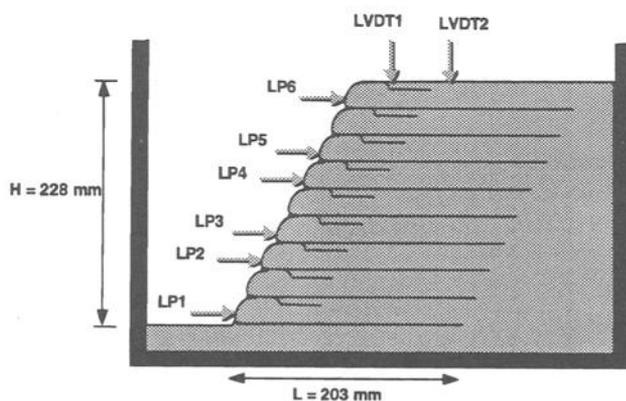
Schematic representation of a centrifuge model with 25.4-mm reinforcement spacing.
